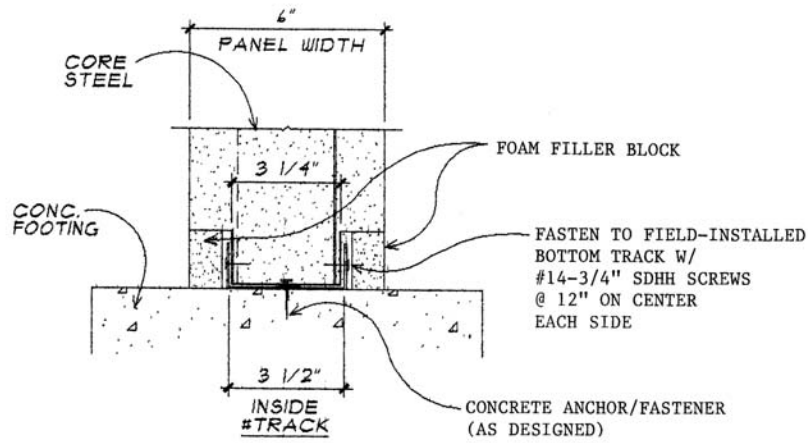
TYPICAL BASE APPLICATION—ABOVE GROUND
